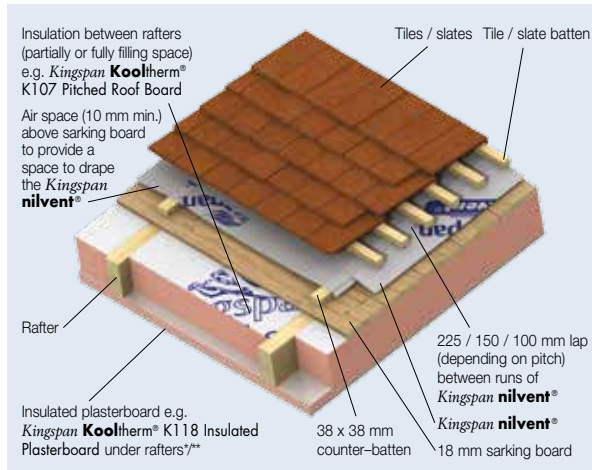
Insulation Between Rafters – Sarking Board – Battens & Tiles
